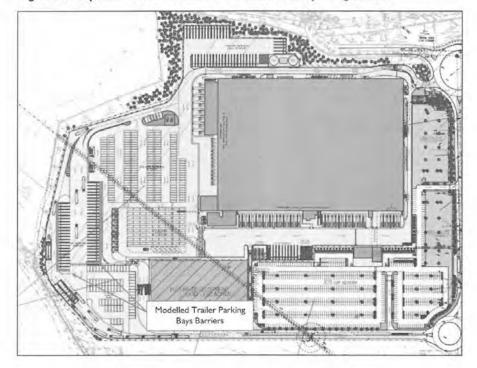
September 2014 draft letter - southern trailer parking barriers
